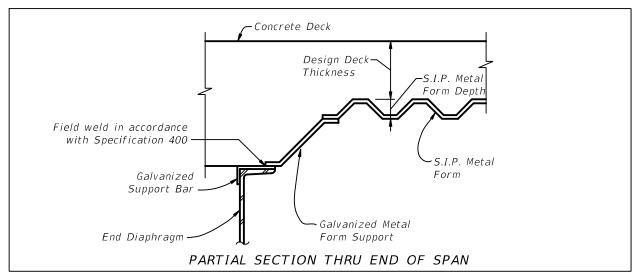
S.I.P. Form Details for Steel I-Girders (End Detail)
